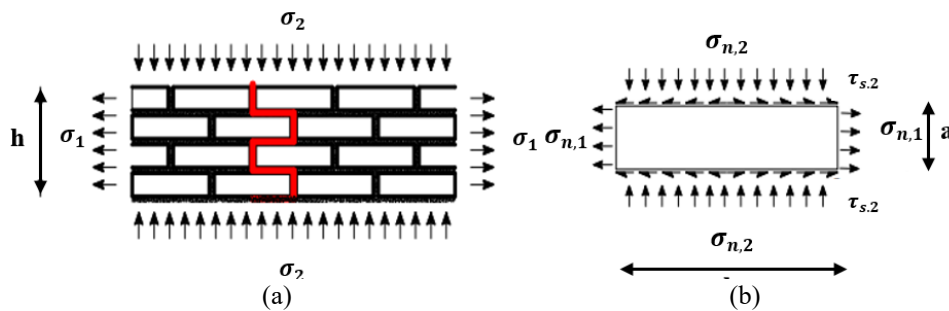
Stress state acting on: (a) a portion of the masonry wall, (b) the single block [18-19].
